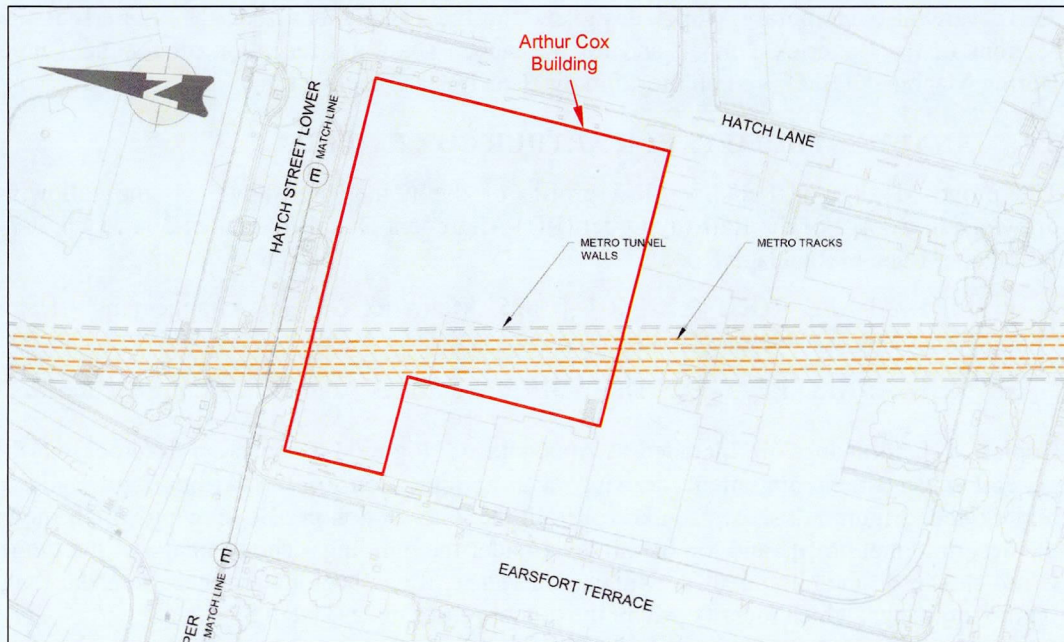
Design tunnel alignment from RO Alignment Drawings
